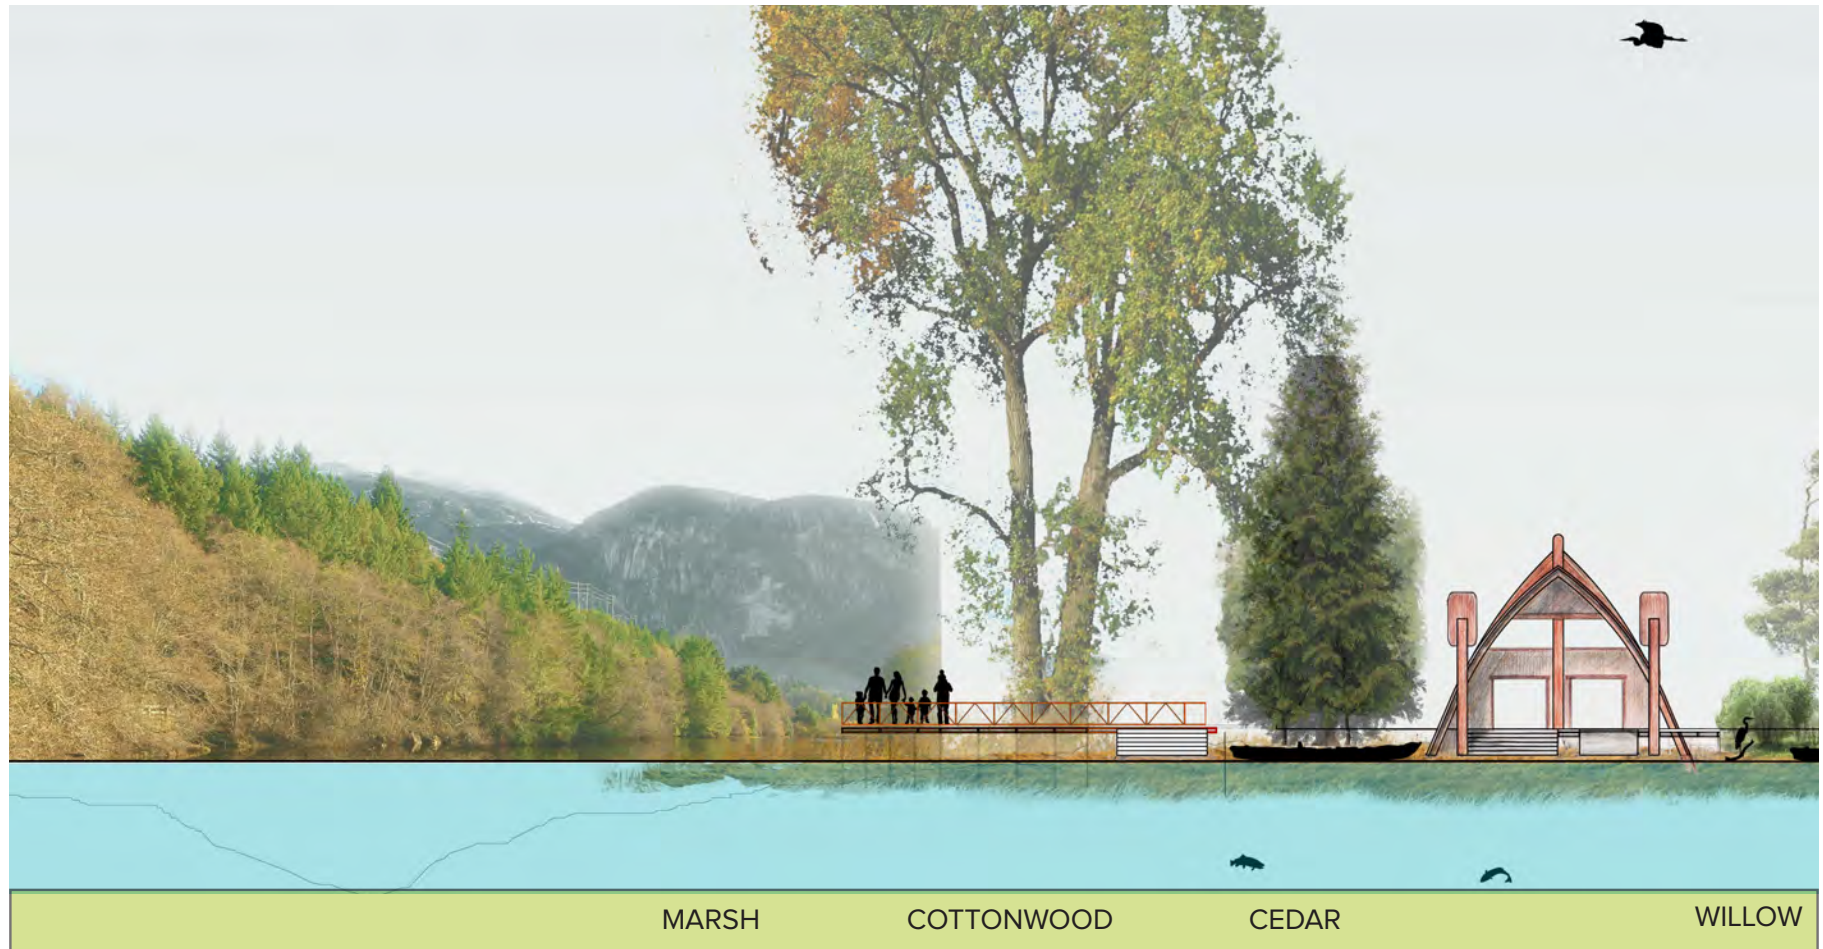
Elevation A-A' : Viewing deck and Kayak House
